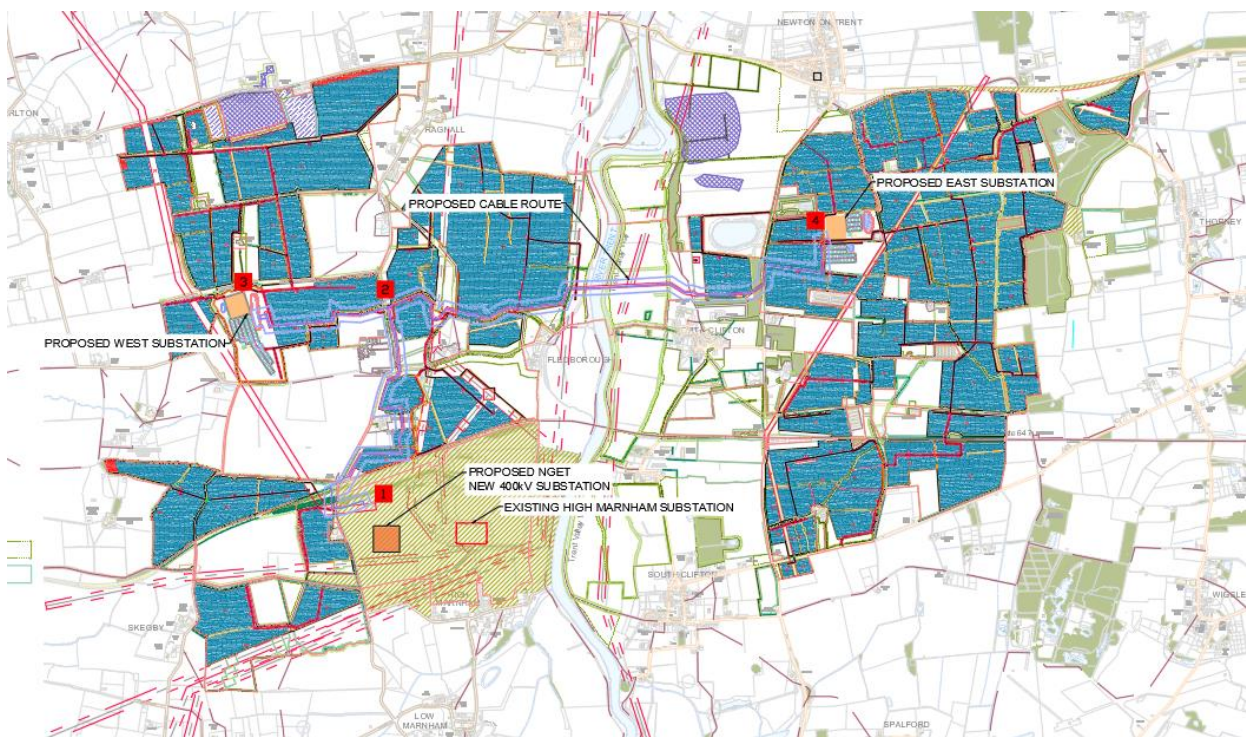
Site layout plan showing cable route and substations with numbers to represent different sections of the route
